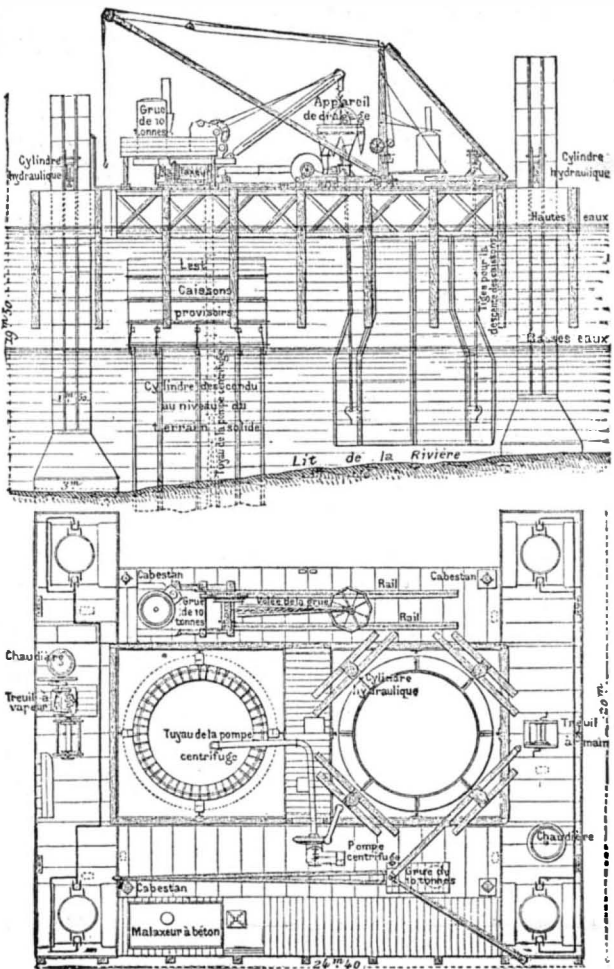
ELEVATION AND PLAN, SHOWING CAISSONS SUPPORTING COLUMNS AND MOVABLE PLATFORM.
